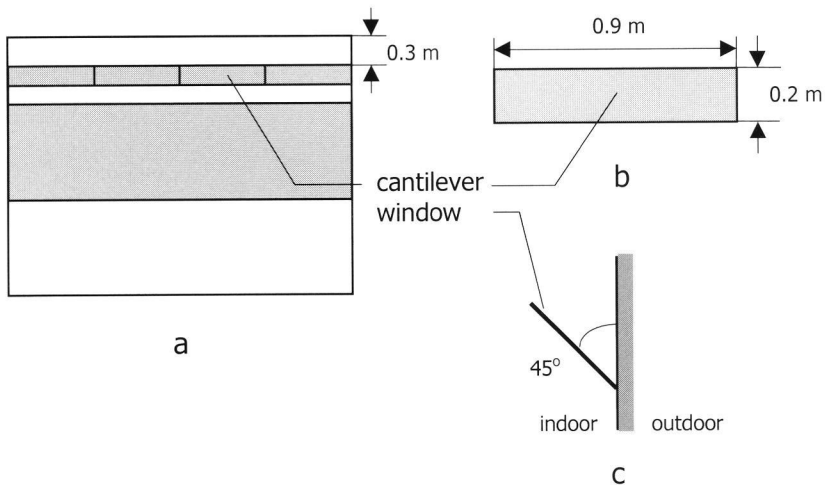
Layout of the facade (a), the cantilever window (b) and a side view of the opened cantilever window (c).
